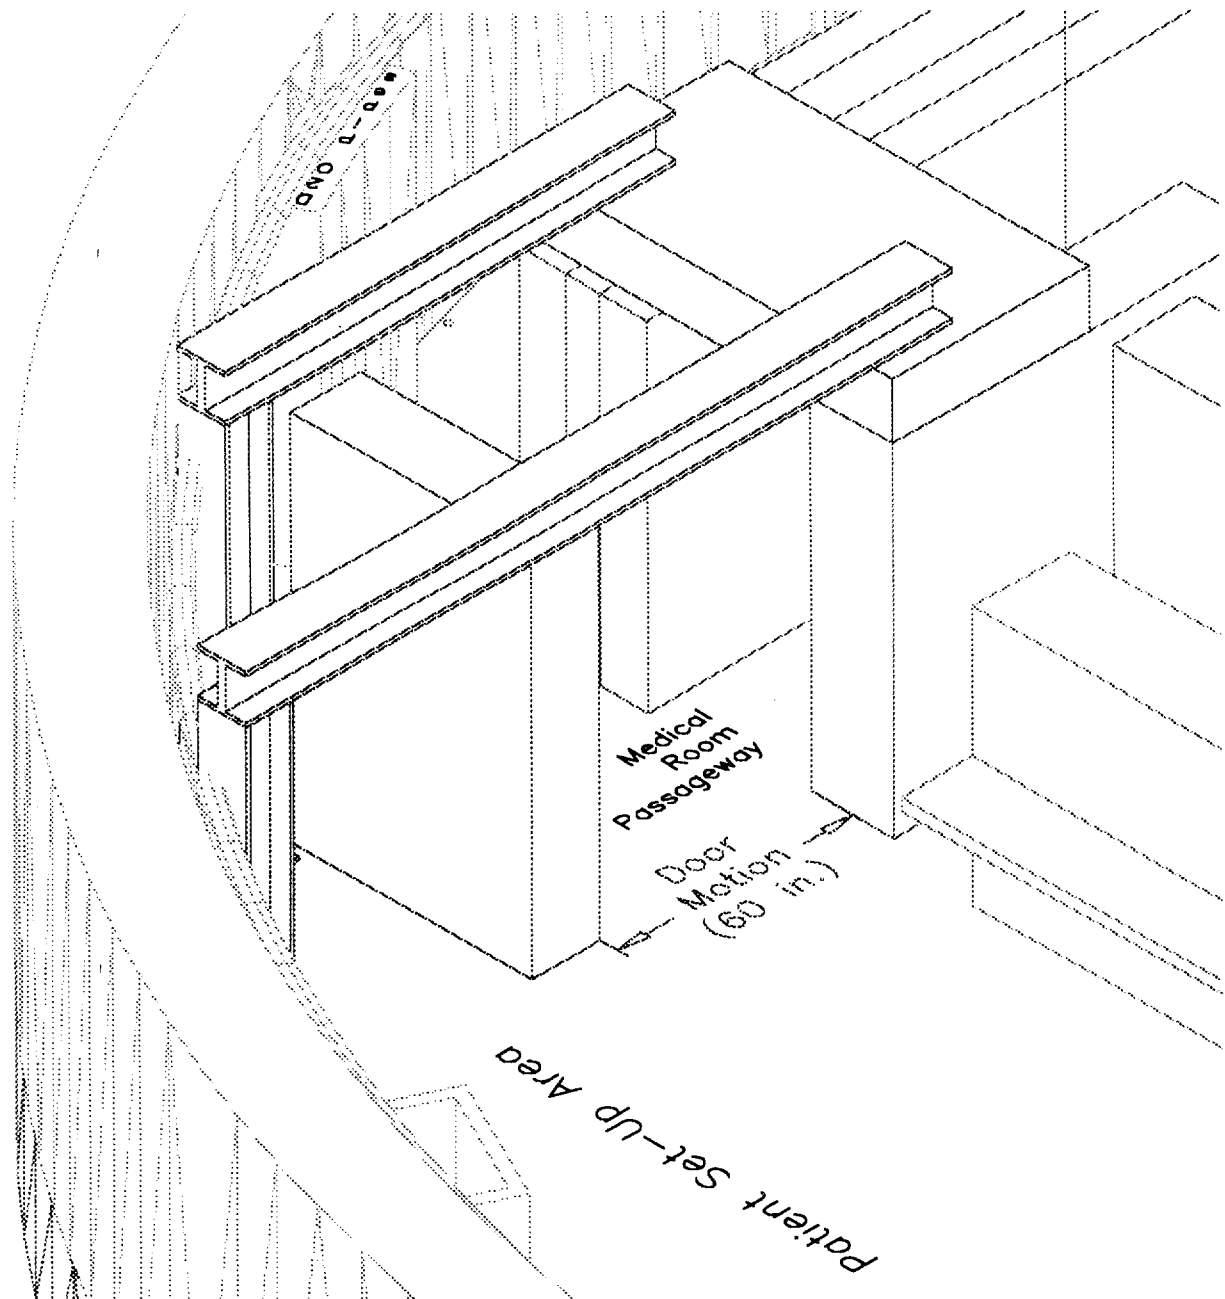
Transverse-to-Beam Sliding Door (suspended from horizontal beams by trolleys -- not shown).
